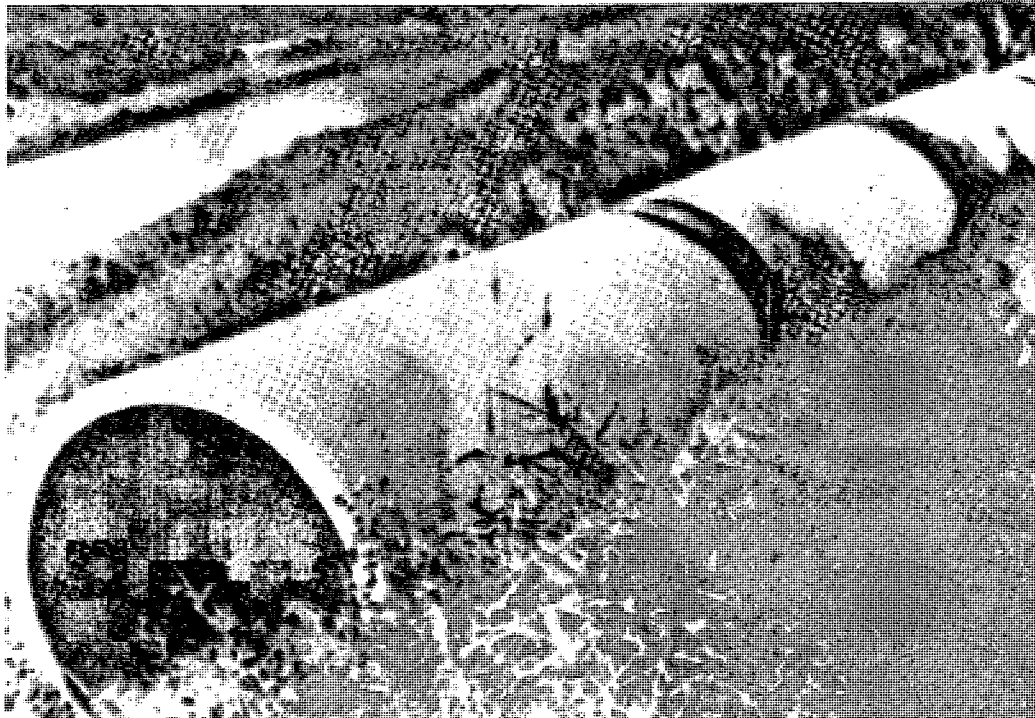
Waste water piping of spun concrete pipes with resin.
